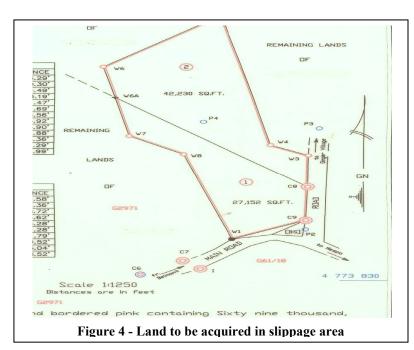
shows the boundaries of the land below the road that is no longer viable. Photo 2 depicts an actual picture of the land from the landslide of 2013. The intervention would require the construction of retaining wall to: 1) stabilise the road and 2) support the section where the land slipped. Land acquisition in the amounts of 27,152 and 42,230 square feet below the slippage (figure 3) is required for bio
